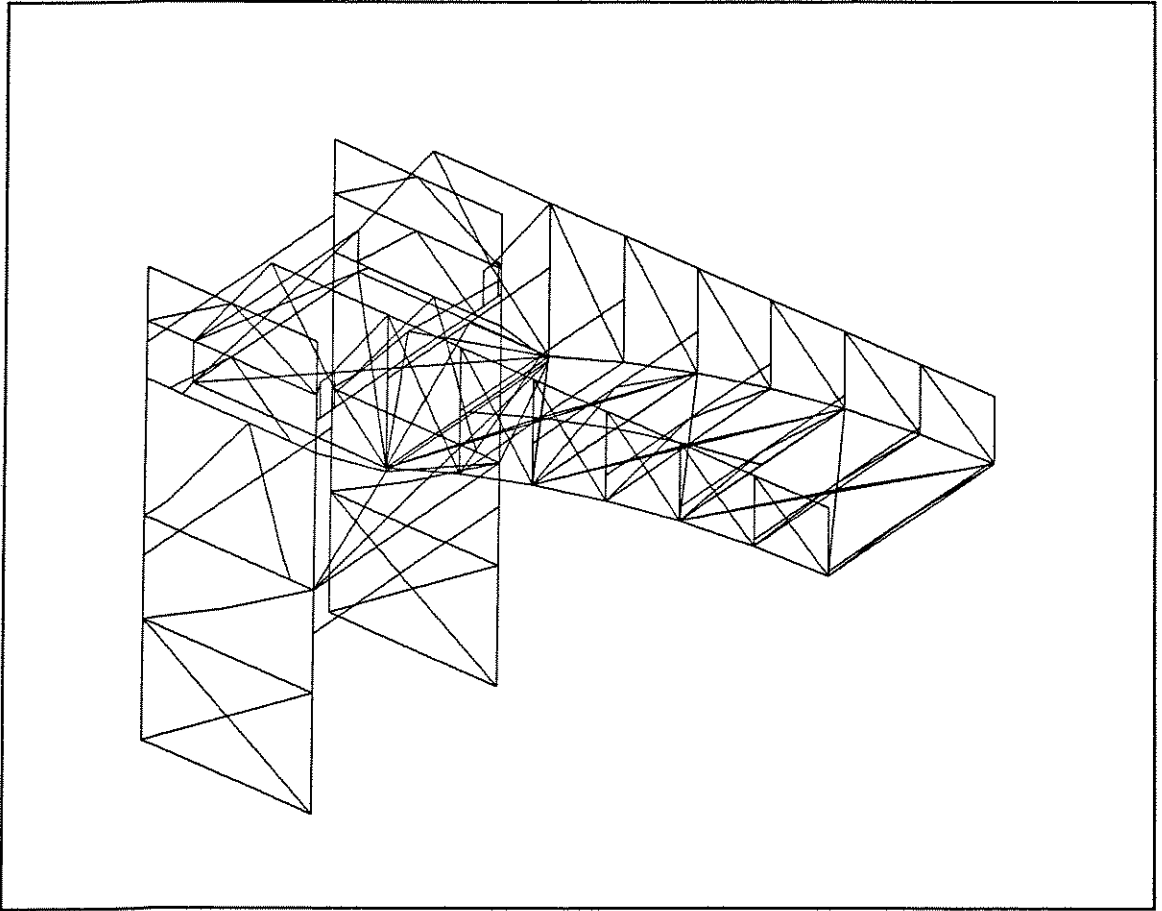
3-D Model of Movable Leaf and Concrete Pier.
